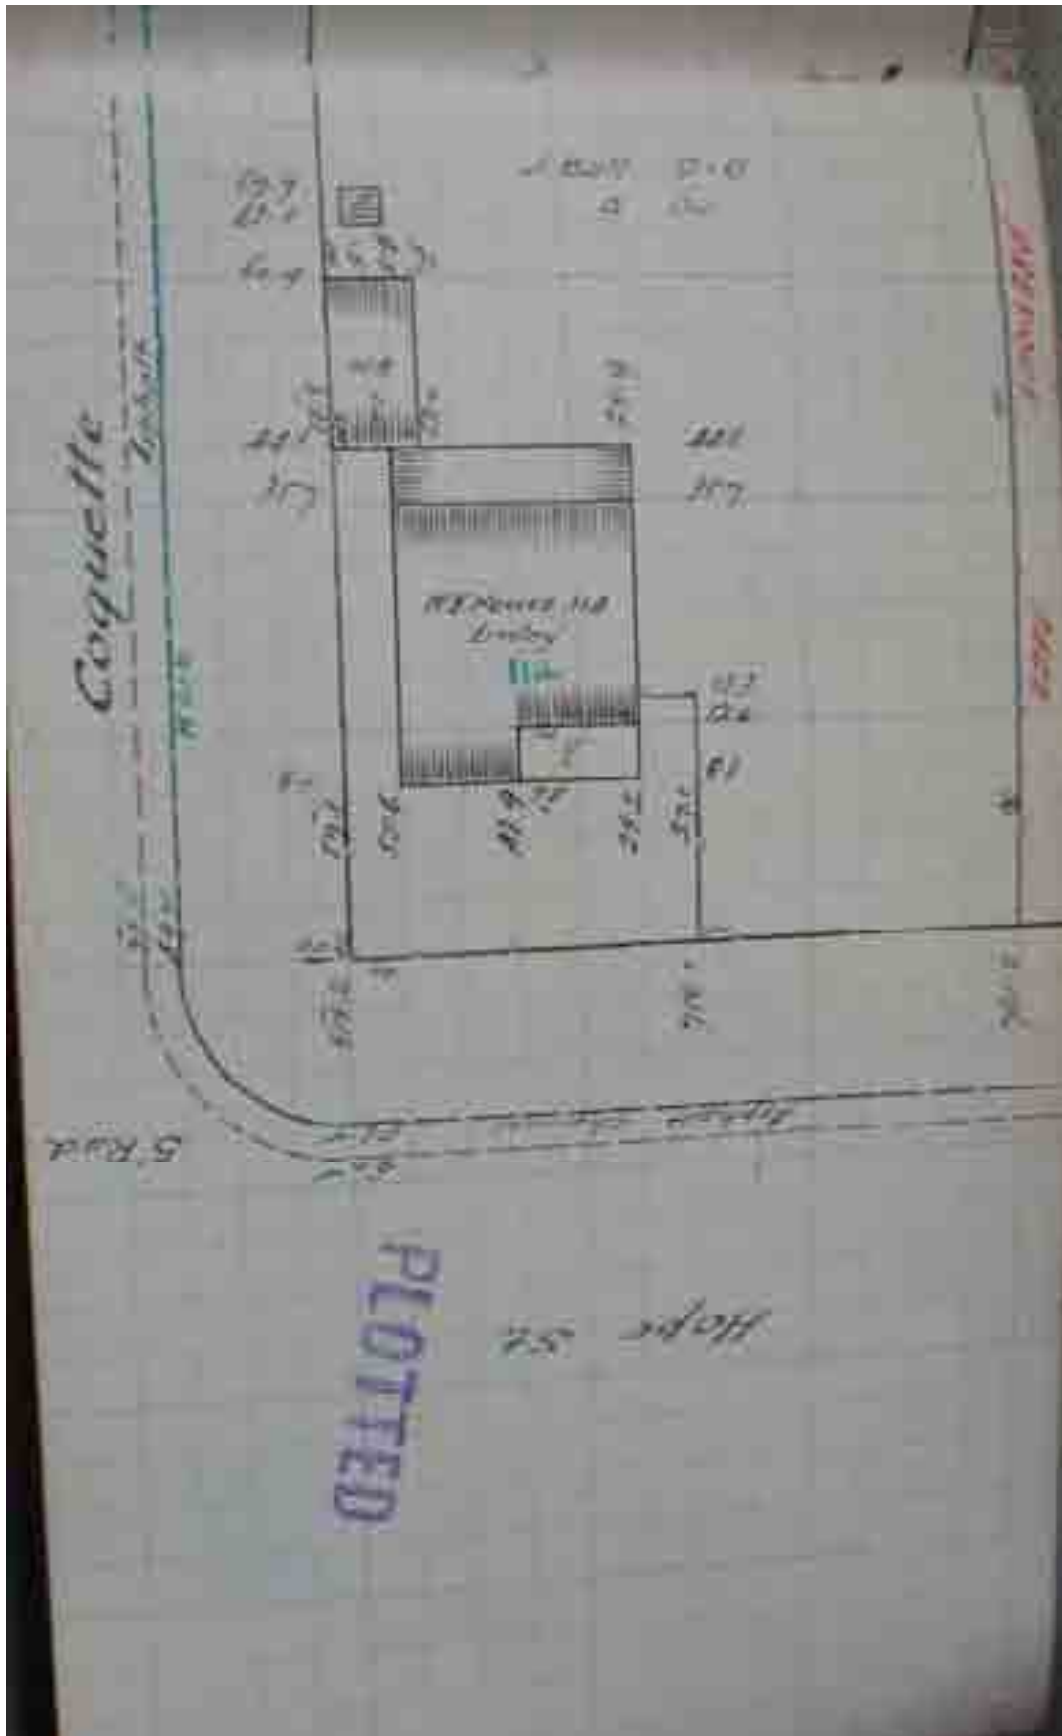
Geelong Waterworks & Sewerage Trust Fieldbook plan no. 142, p.8, c.1912, showing asphalt channels as broken lines. Source: Barwon Water collection.
